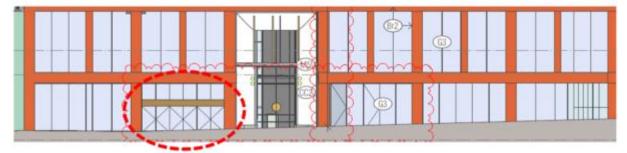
Proposed amendment of Mills Boulevard elevation, south of Village Square
